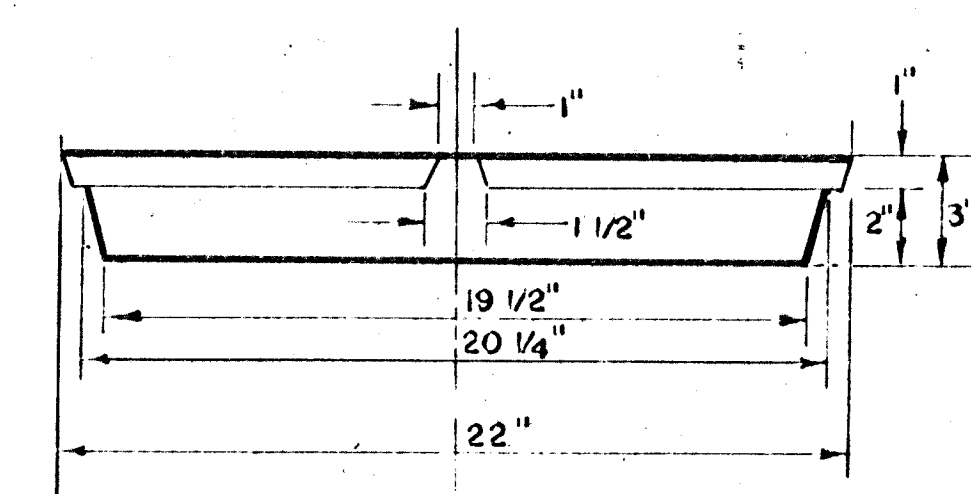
DETAIL IN CONNECTION WITH THE TERMINATION OF CONCRETE ENCASMENT OR CRADLE FOR CLAY PIPE
